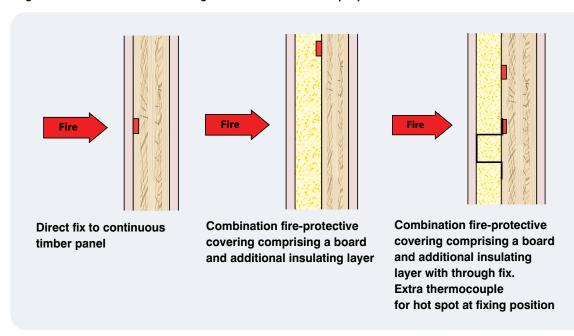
Modified RISF thermocouple positions for typical specimen configurations.
